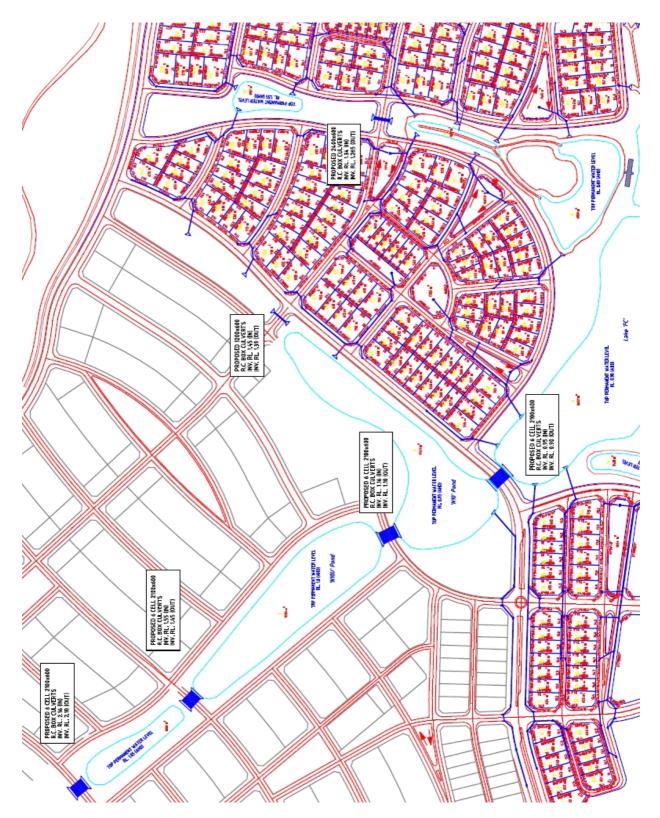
(a) Concept Layout and Crossing Details for Preliminary Concept Development
